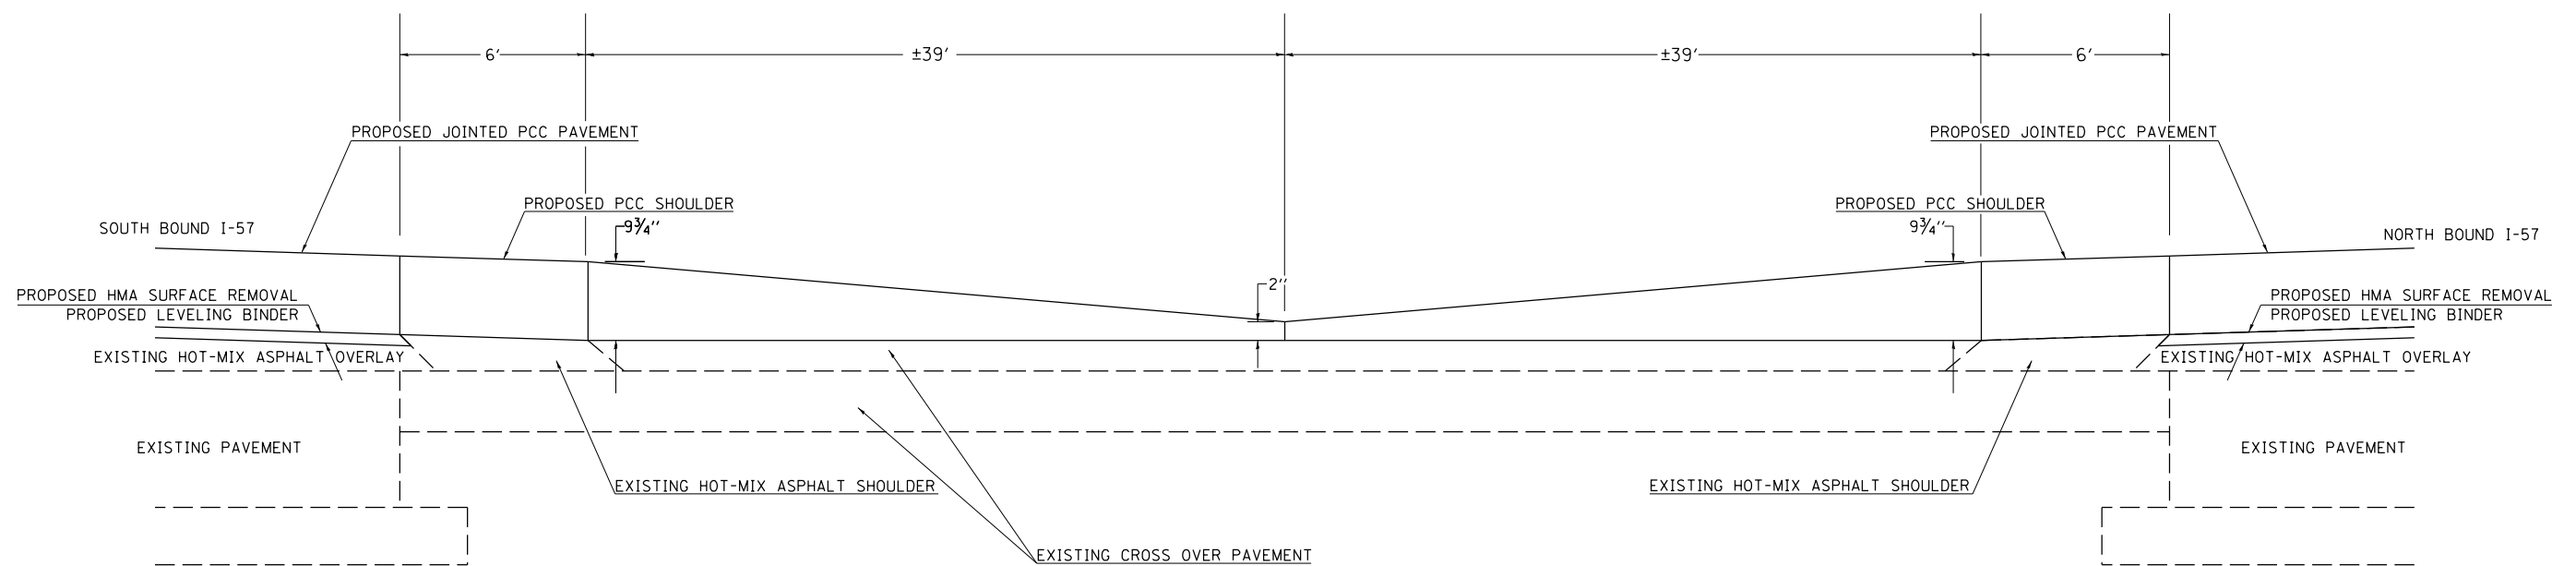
DETAIL OF MEDIAN CROSSOVER PLAN VIEW
